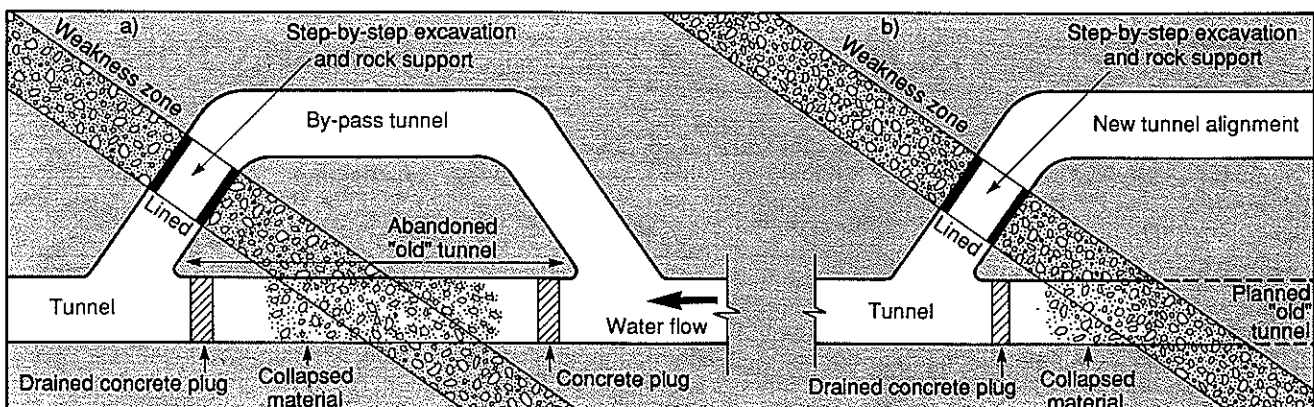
Examples of by-pass solutions if large, progressive collapses occur in tunnels conveying water: a) slide occurred after tunnel excavation was completed; and b) during tunnel excavation.
